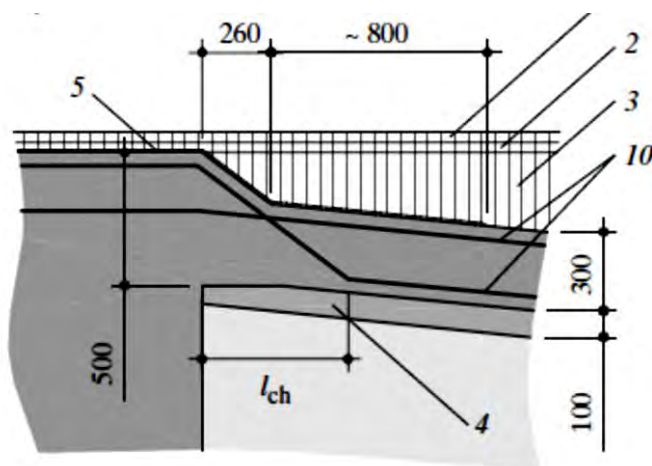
Improved detail for integral abutment bridges (Dreier et al 2011)
